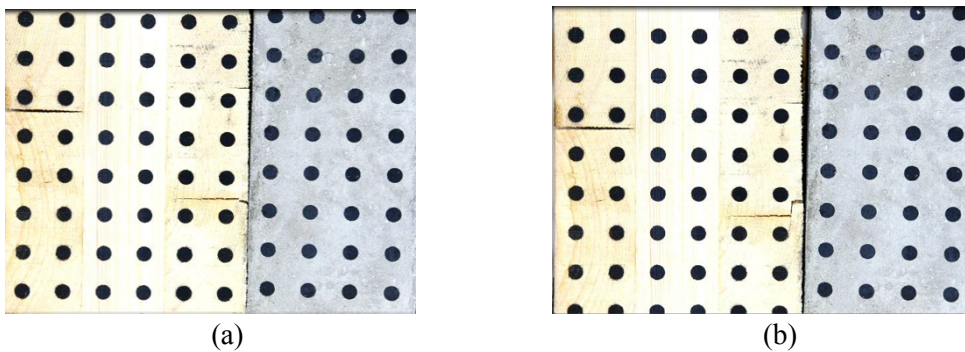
Crack opening between timber and concrete elements for the 40-NN-2 connection.
